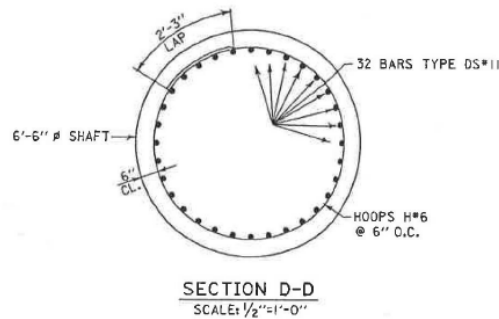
Cross Section of Drill Shaft of Highway Bridge in Marshall County
